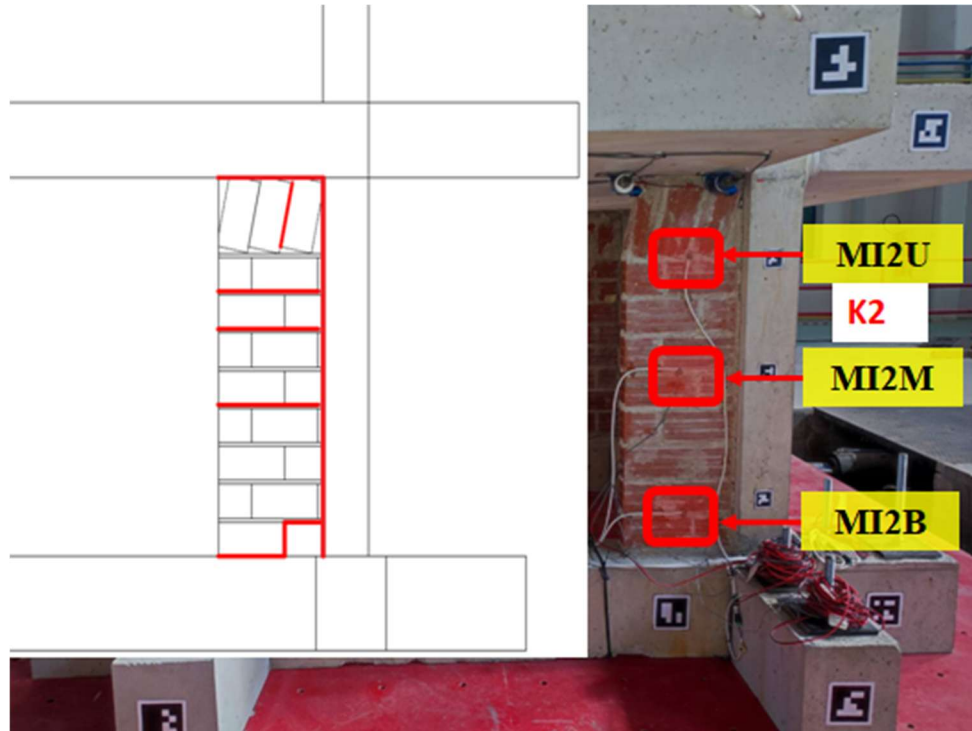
Observed damage after 1.1g test and location of PZT sensors on full Infill wall between columns 2-3
